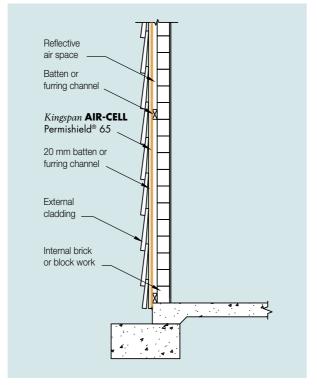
Side elevation of Kingspan AIR-CELL Permishield® 65 in a reverse brick veneer wall
